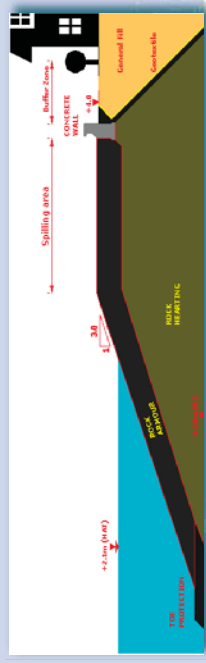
EDGE PROTECTION WITH WIDE SPILLING AREA
